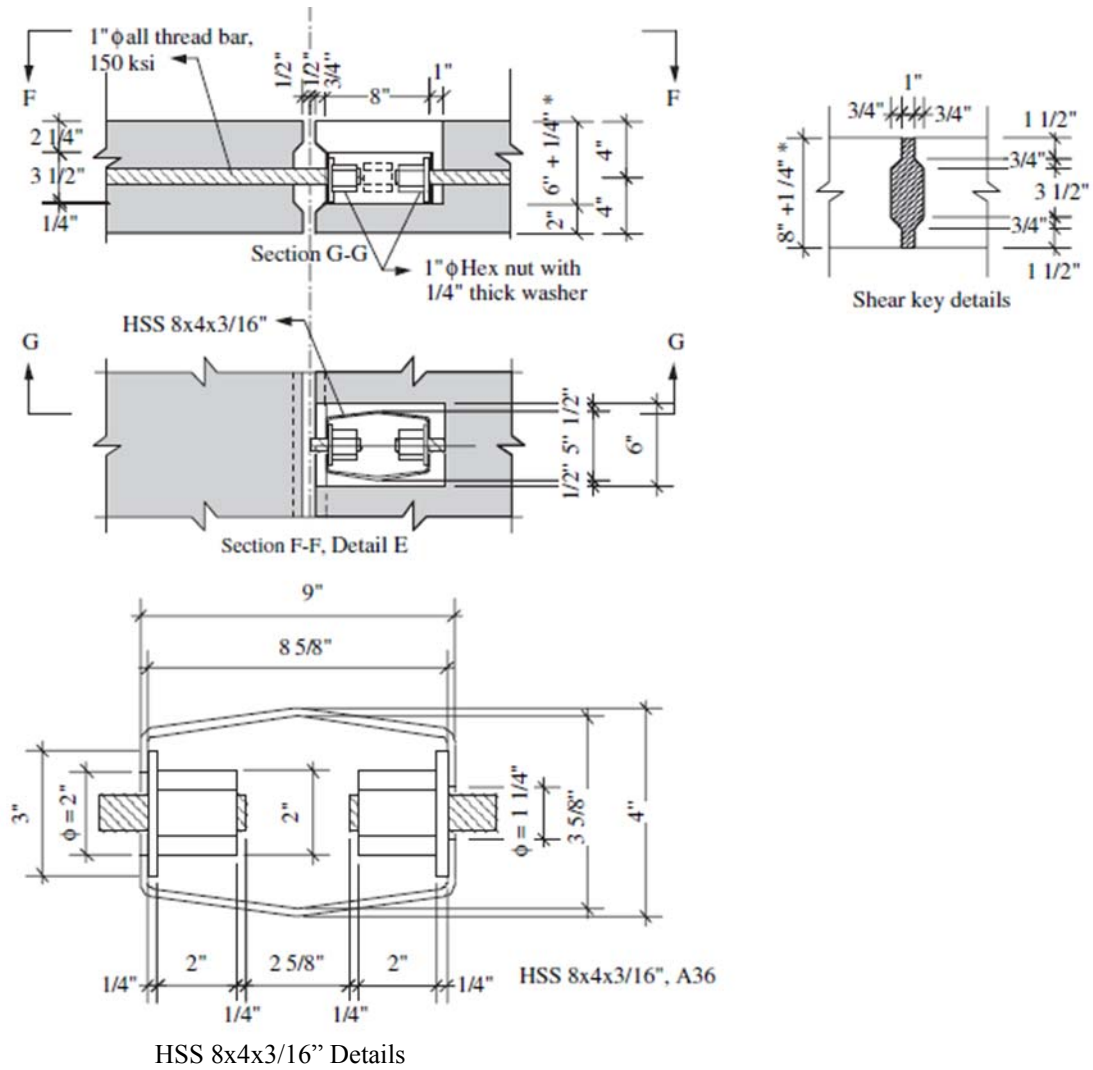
NCHRP System CD-2 Transverse Connection Details (Badie and Tadros 2008)
